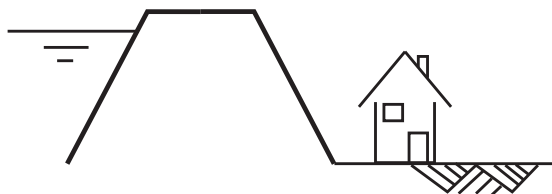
Option 2: Conventional dike reinforcement near a building.
